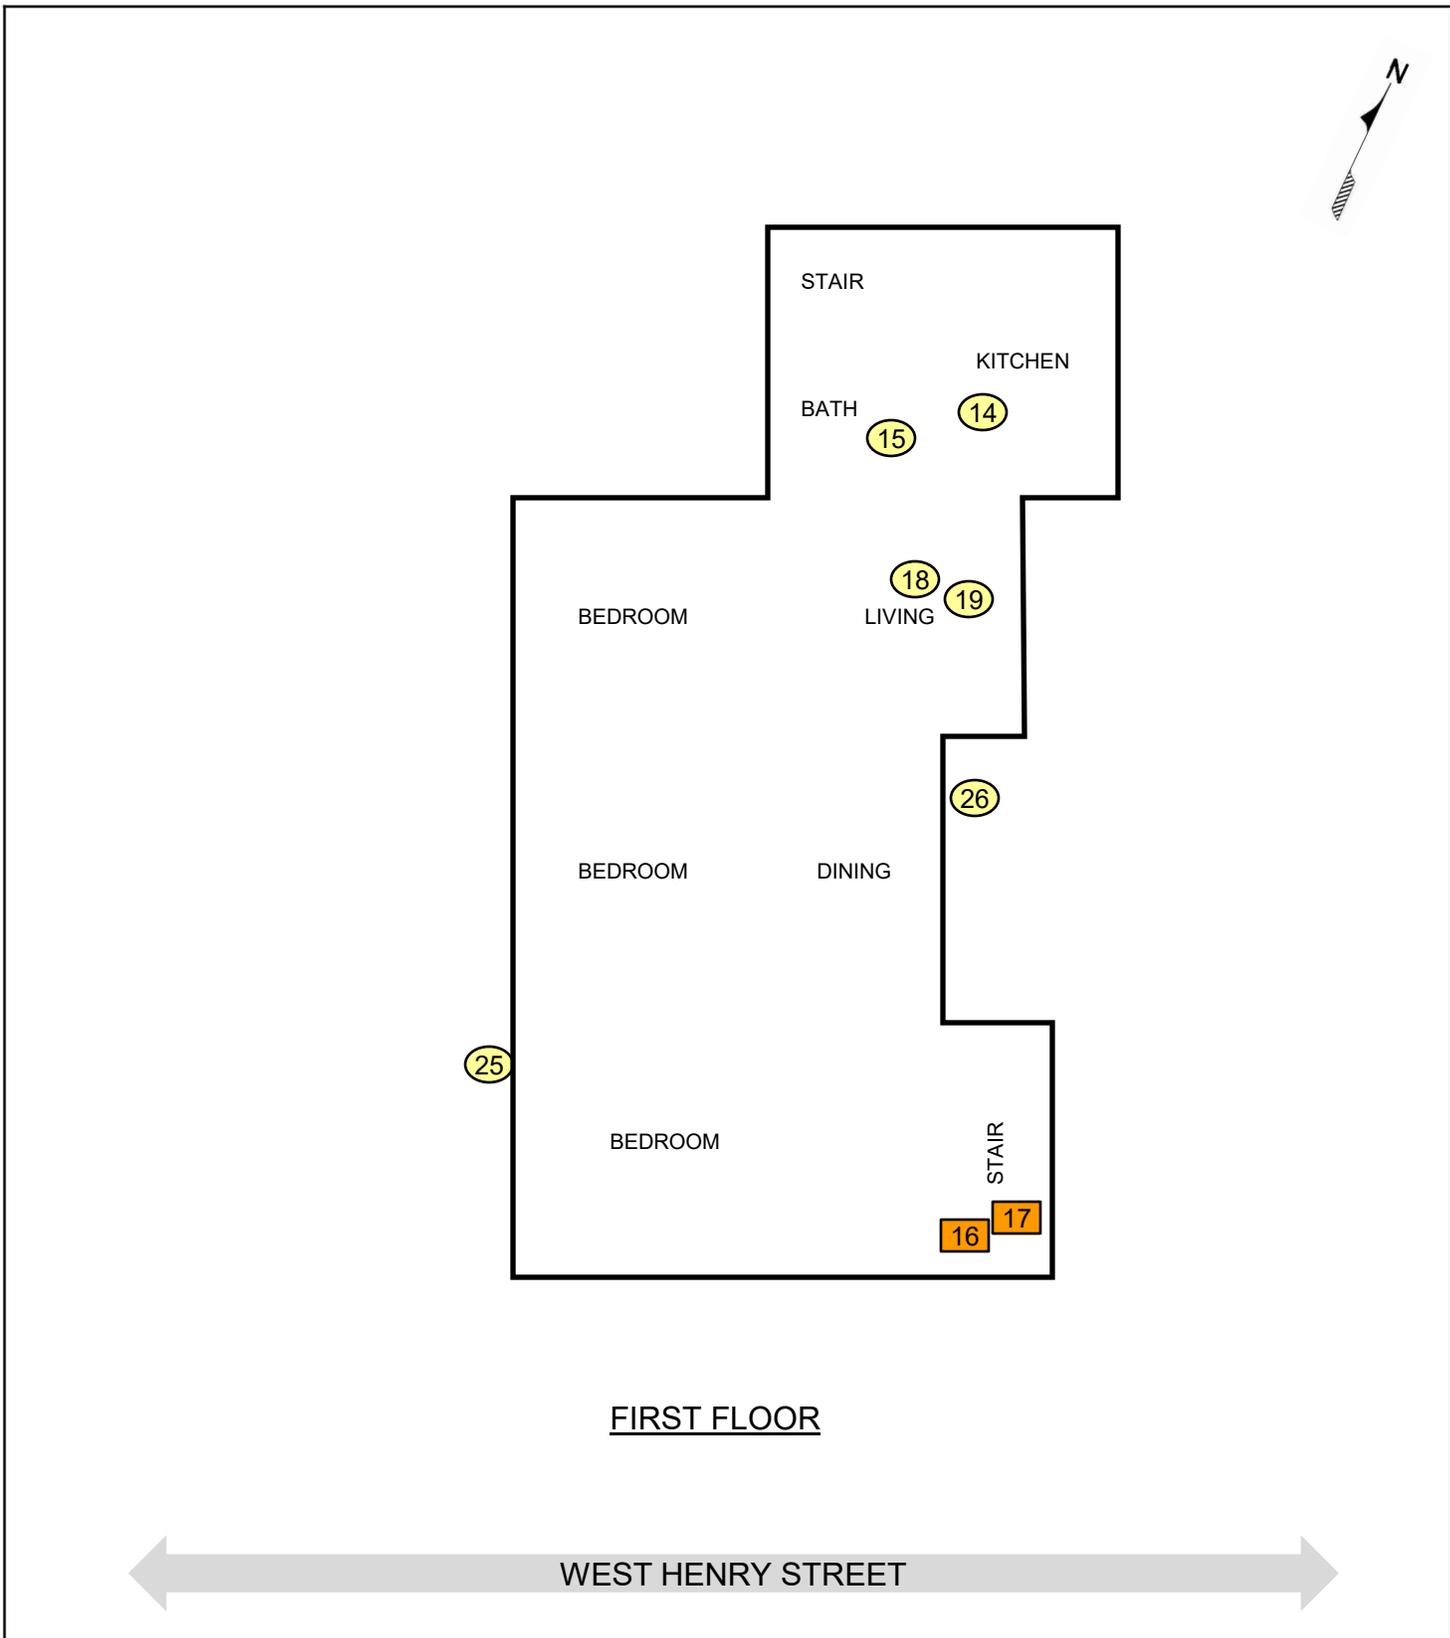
BUILDING AND SAMPLING DIAGRAM
